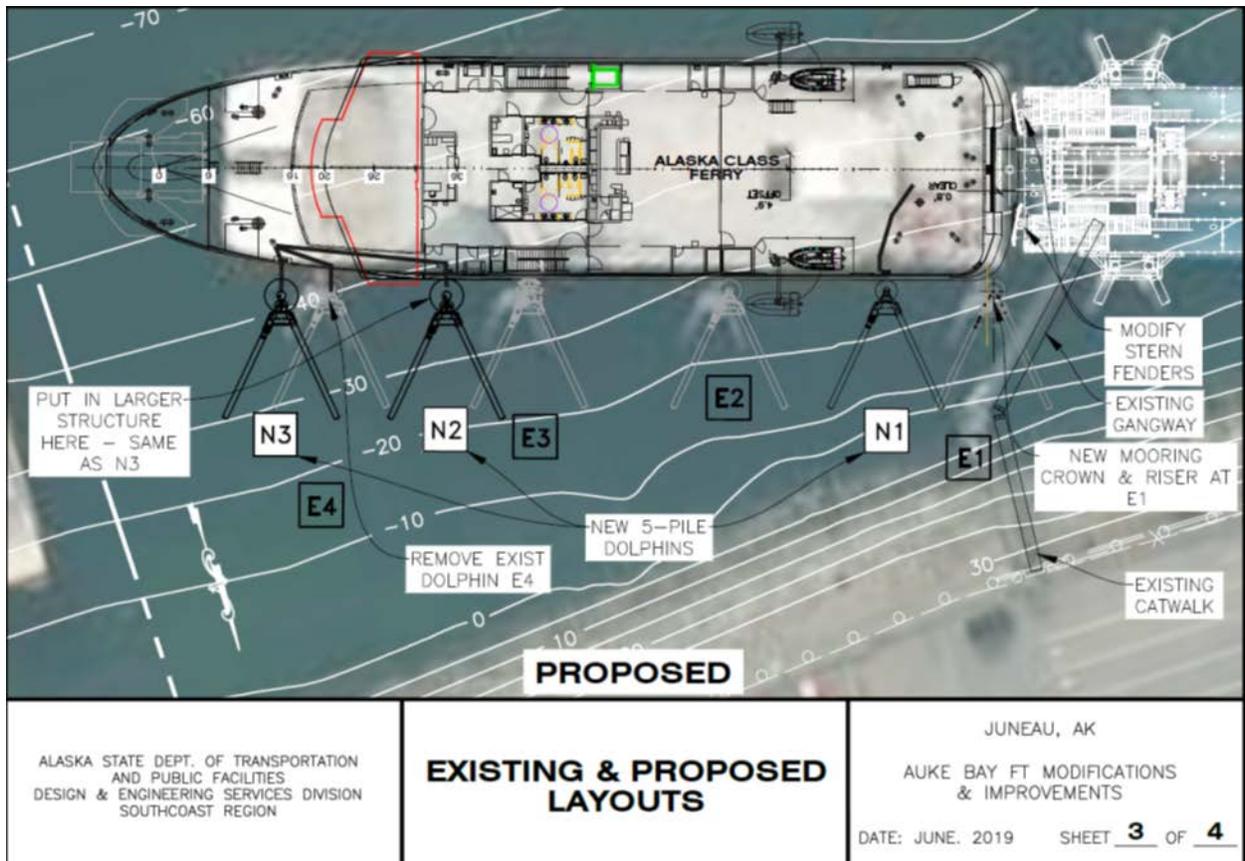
Site Plan for the proposed Auke Bay Ferry Terminal Modifications Project (ADOT&PF 2019b)
